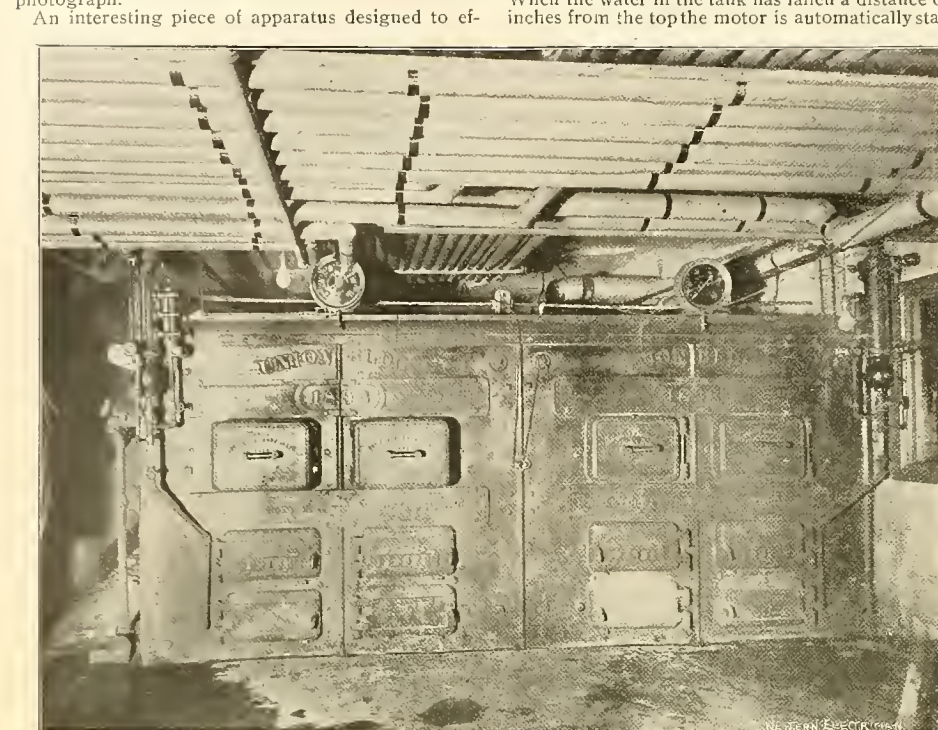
MECHANICAL AND ELECTRICAL EQUIPMENT OF THE UNION HOTEL.—SPECIAL TUBULAR-TYPE BOILERS.
